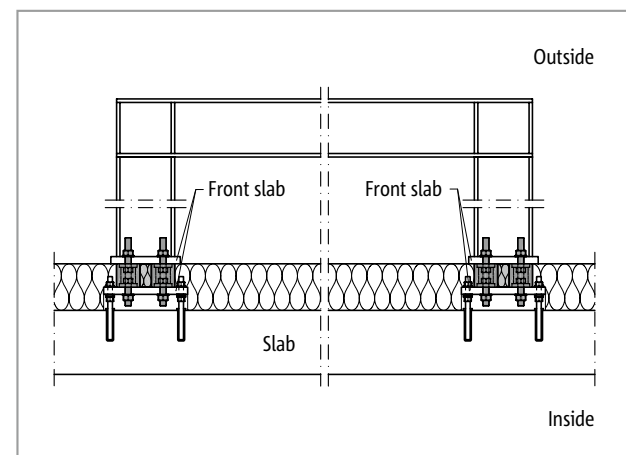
Schöck Isokorb® T type S-V for rigid frame connection for secondary structures (additional moments from imperfections are to be taken into account)
